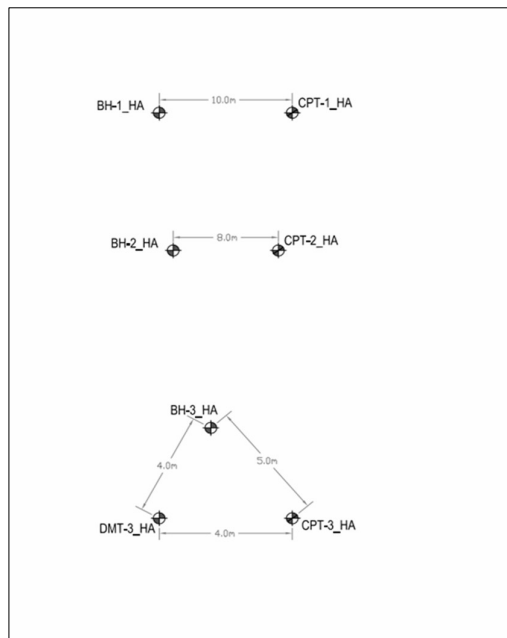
Schematic test location plan at Site-4 (HA)
